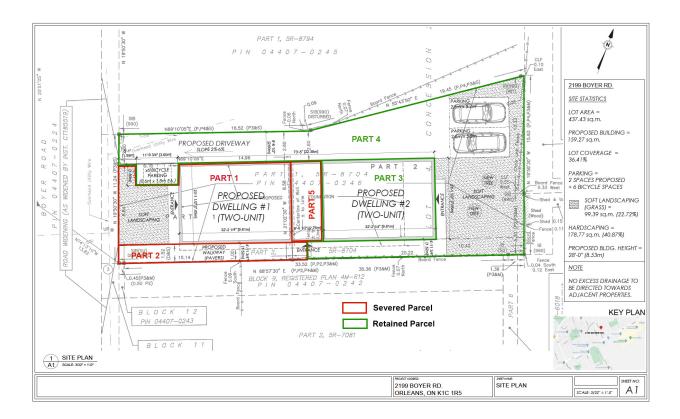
Site Plan (Source: EJ Drafting and Design, Markup by Q9 Planning + Design)
